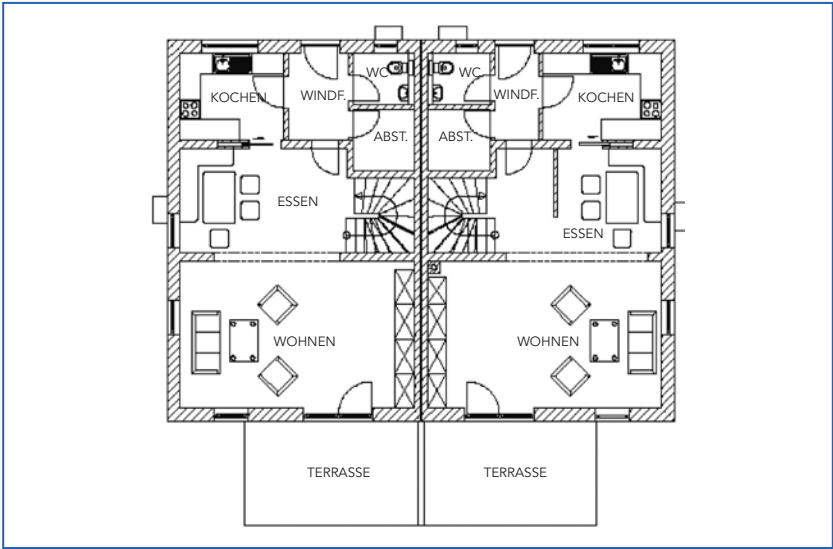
Ground plan (ground floor) of a typical semi-detached house in Germany.
